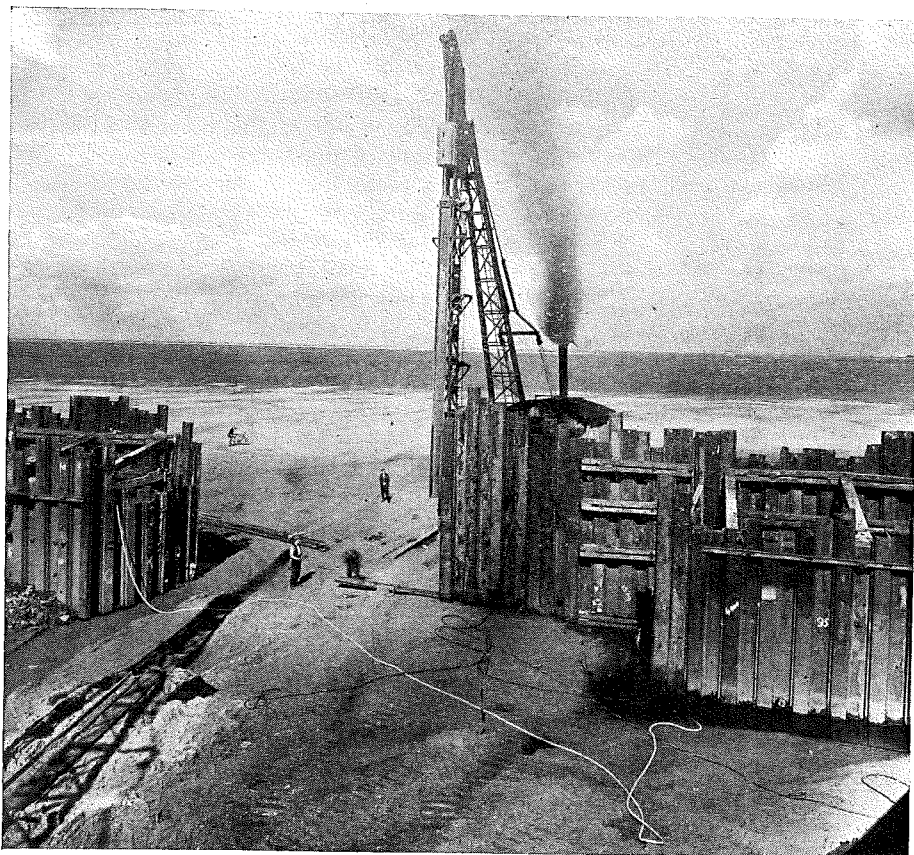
DRIVING STEEL SHEET PILES USING HANGING LEADERS.
